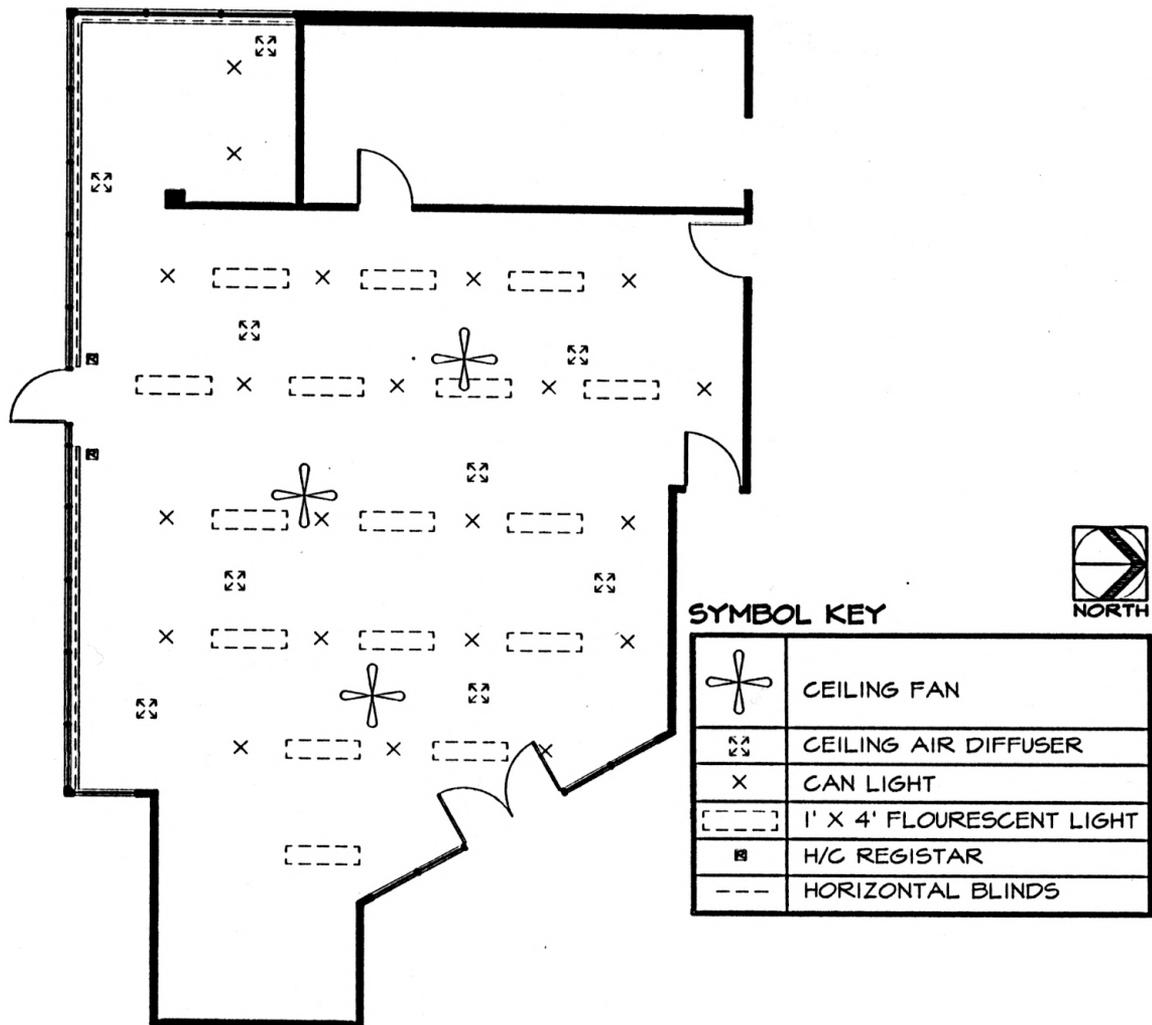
Plan of Assisted Living Dining Room - Site 1.
